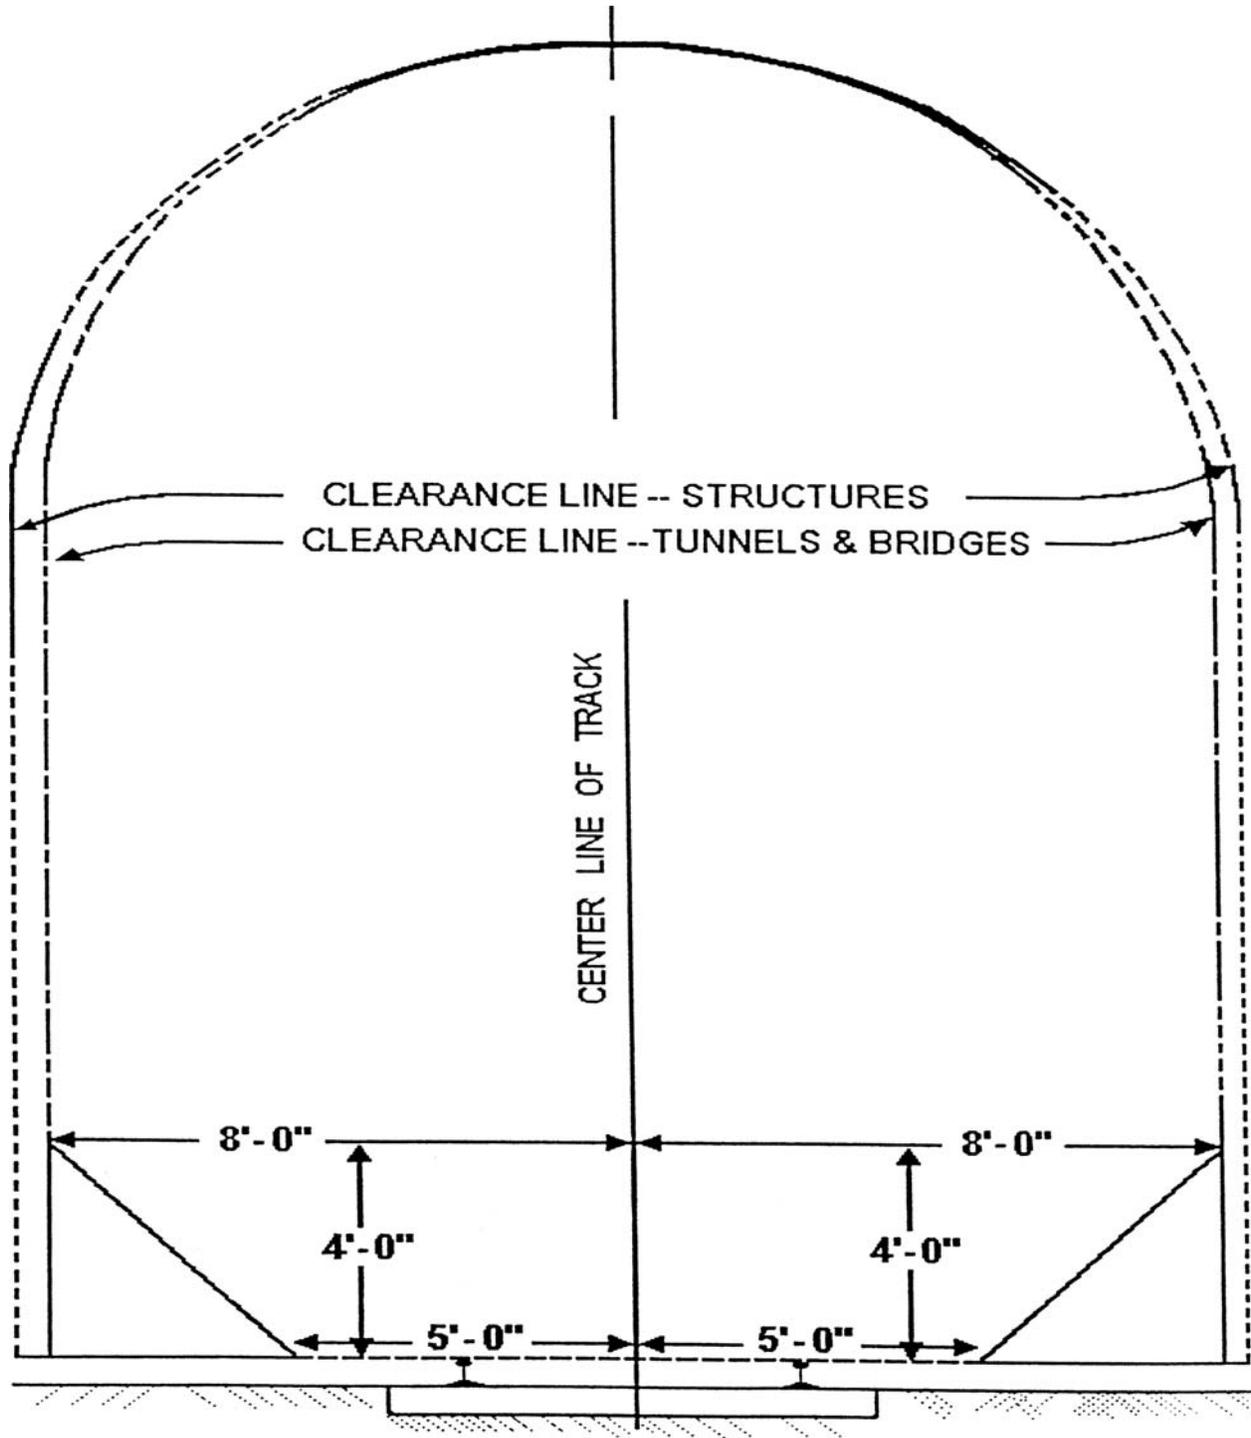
A - Minimum Side Clearance for Certain Structures in or on the Lower Sections of Bridges and Tunnels
